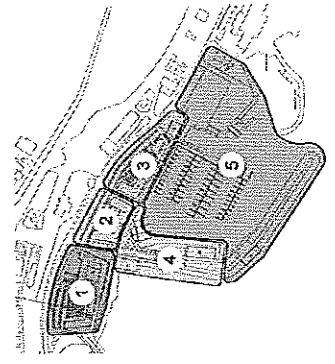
ALBANY WATERFRONT PRECINCT PLAN
